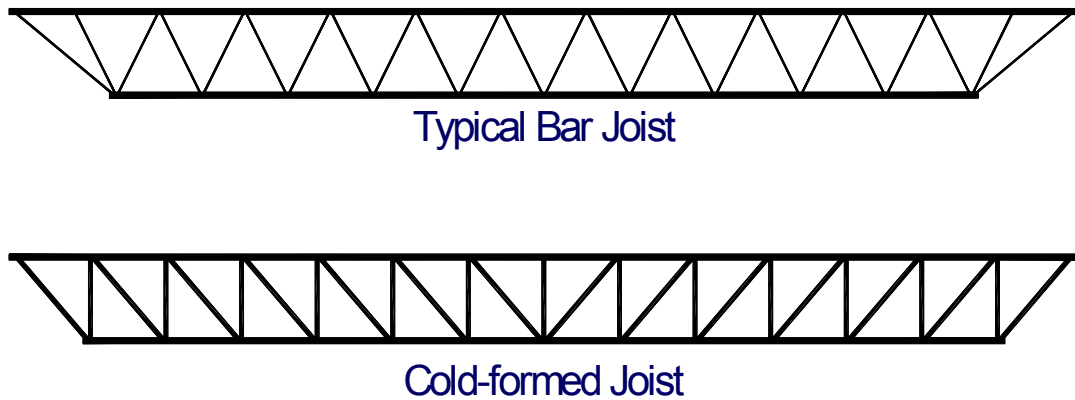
Bar Joist vs. Cold-Formed Joist – elevation view
